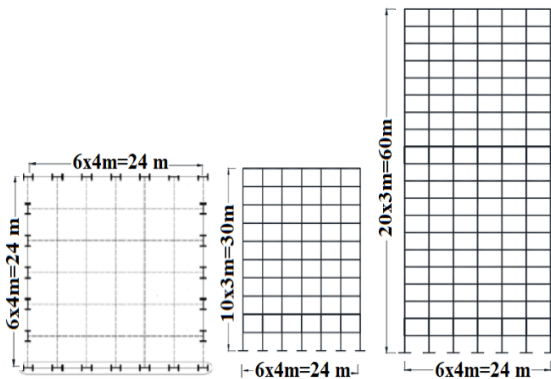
(a) The typical plan of the buildings used in this study, and (b) Elevation of ten- and twenty-story Steel Special Moment Frames
